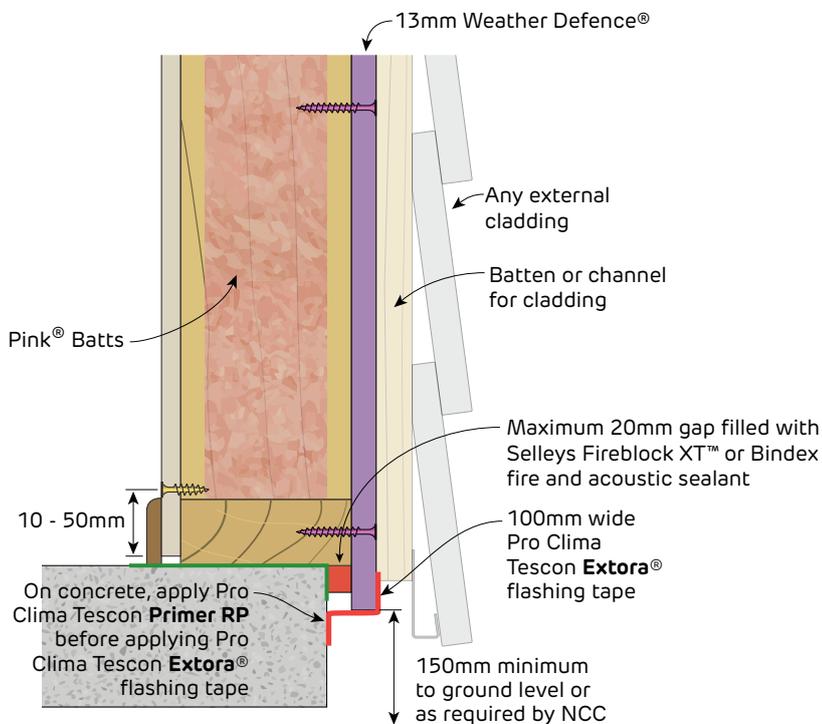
External Timber Stud Wall Base - Alternative Section
